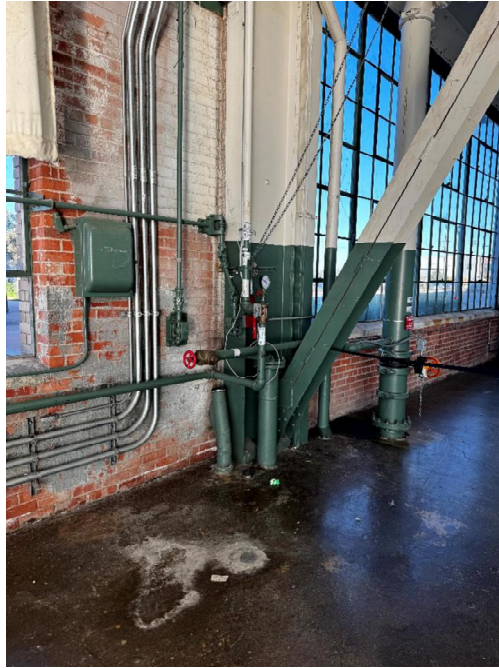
Ceiling water conveyance pipes (1/8/2026)
